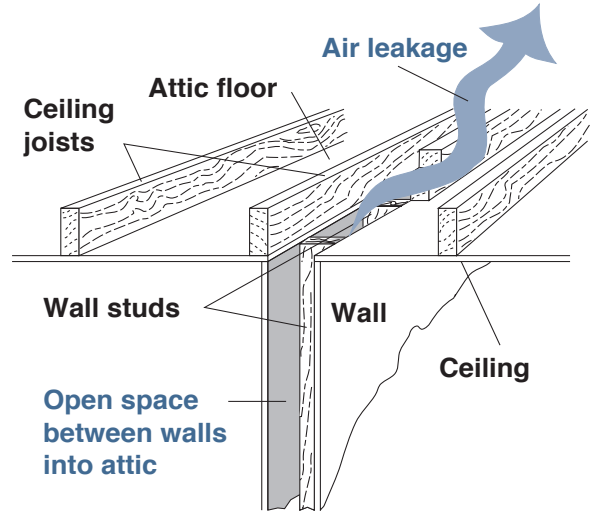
With "balloon framing," open wall cavities allow air and heat to flow up into the attic.
